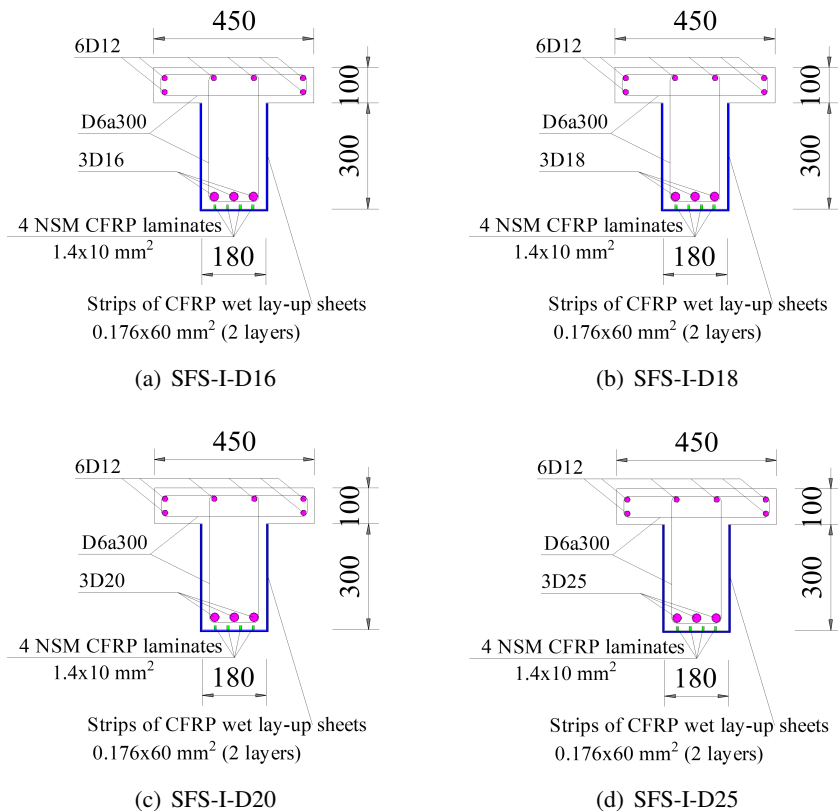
Cross-section of strengthened T-beams with various diameters of longitudinal tension reinforcement
